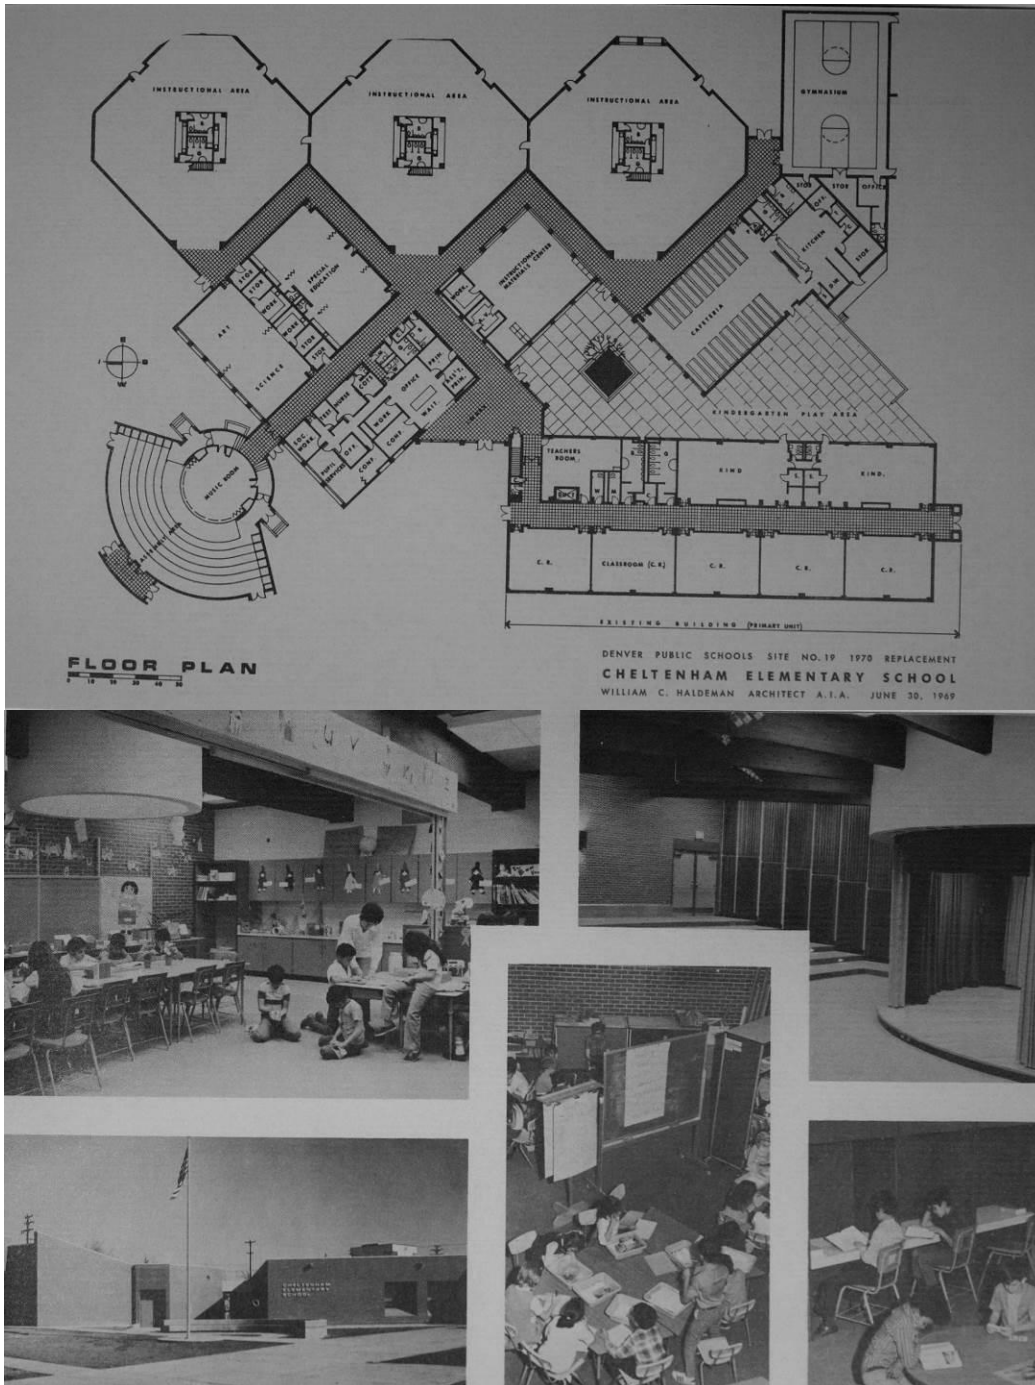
Cheltenham Elementary School brochure. Original school building traditional classrooms with open plan addition. Original building by Smith and Thorson completed 1964. Addition by William Haldeman completed 1970. (Denver Public Library, Denver Public School collection).
